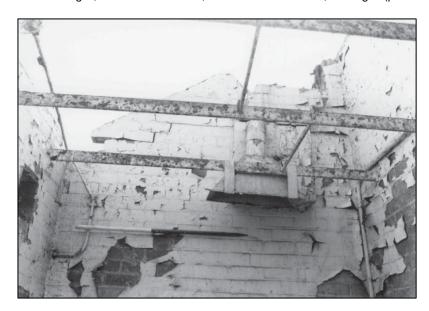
Building A, 1F SE corner room, detail of roof structure, looking S (photo 8/4).
